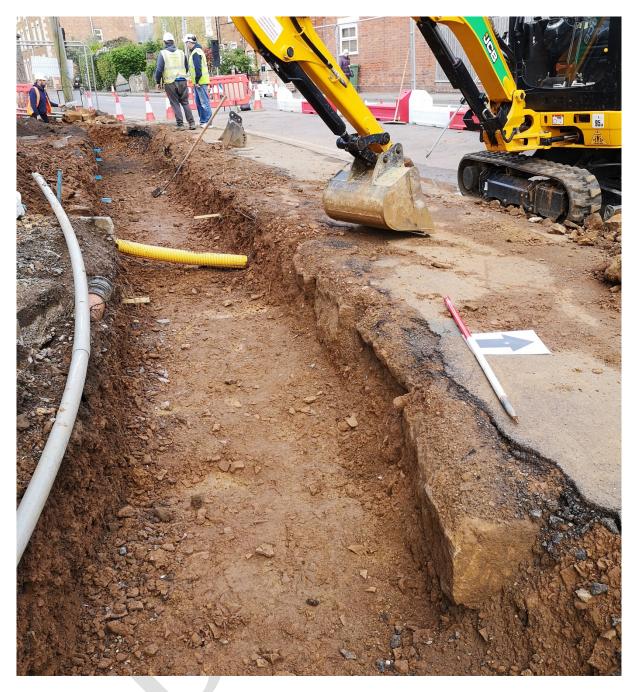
New footings trench after excavation. Also shows original footings beyond the line of the wall (right).
